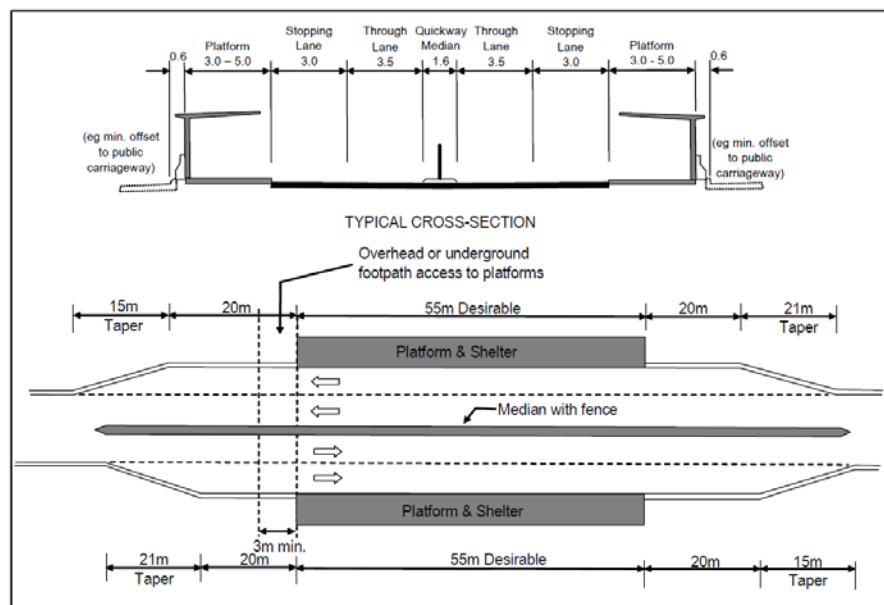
Brisbane station typical cross section (FTA, 2008)
